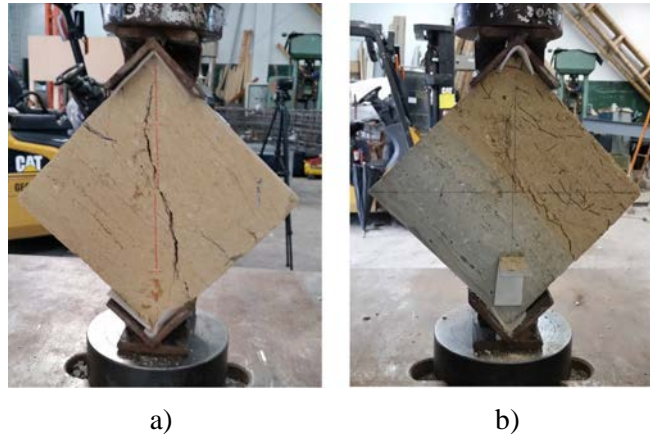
Failure mechanisms under a diagonal tension test for: a) rammed earth masonry assemblage and b) rammed earth with smooth transition and upper beam assemblage
